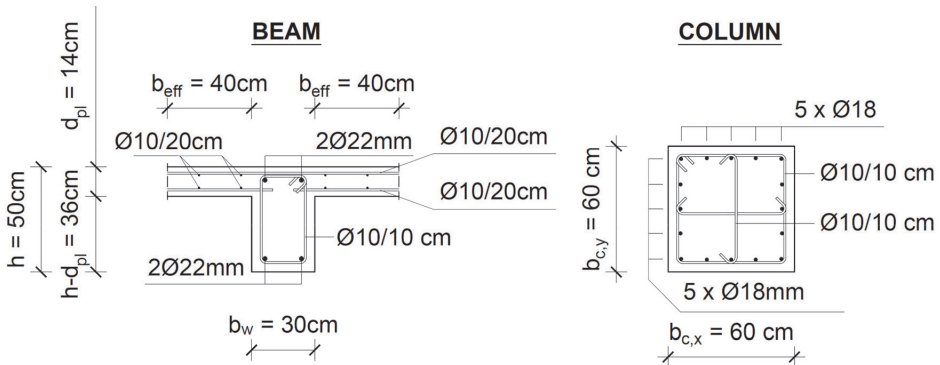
Geometric and reinforcement characteristics of the cross-section properties of the beams (left) and columns (right)
